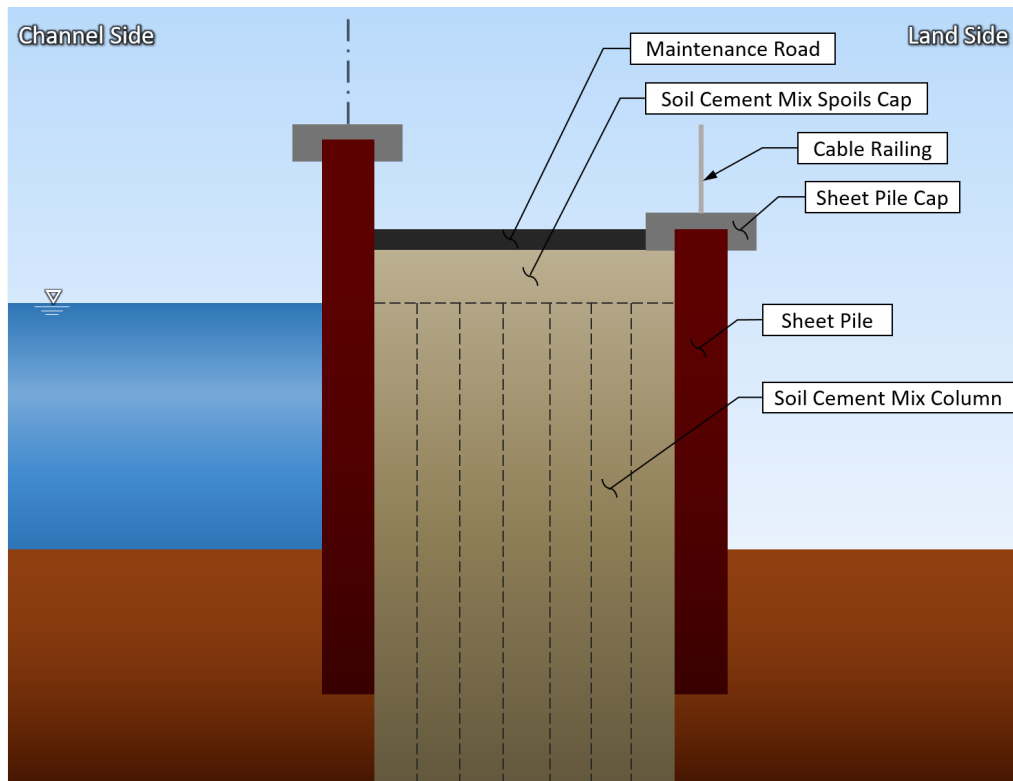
DSCM Columns are Augured between Two Rows of Parallel Sheet Piles, Creating a 3-Tier-Line of Defense against Levee Failure.
